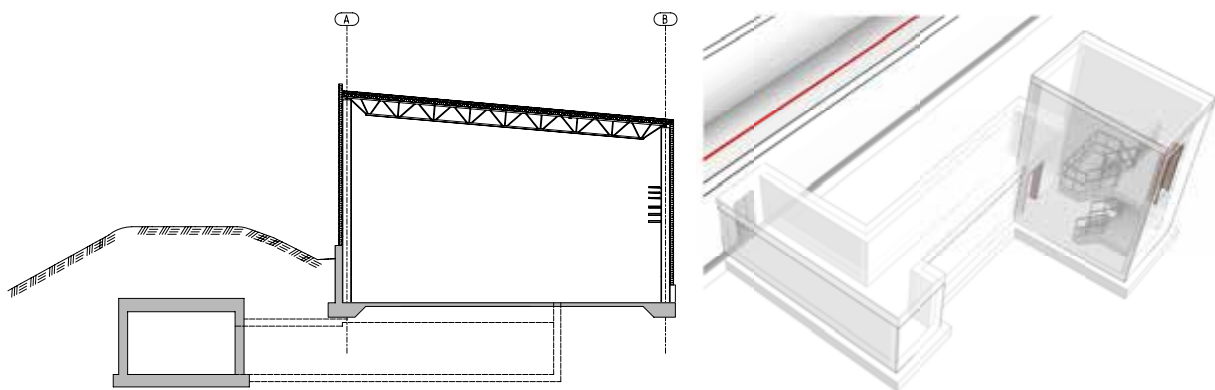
Accelerator tunnel and klystron gallery. Left: Standard section of the tunnel and the klystron gallery, showing an underground interconnecting stub. Right: Emergency exit labyrinth, from the accelerator tunnel.
